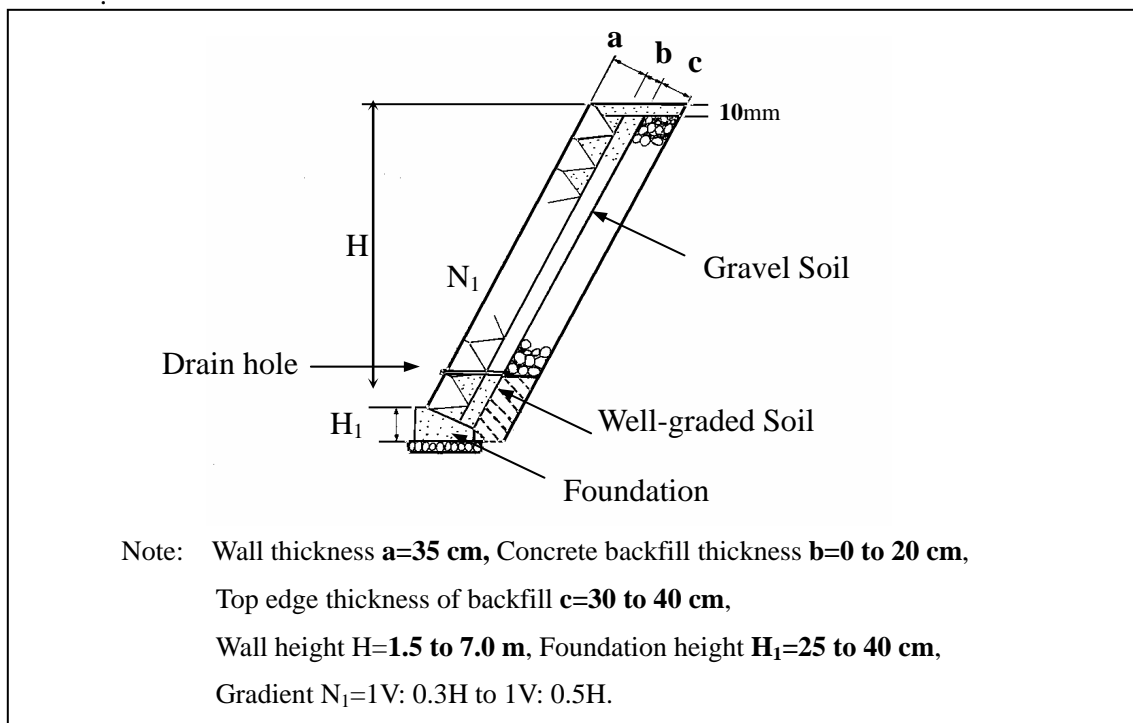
Detail of Stone or Concrete Block Retaining Wall
